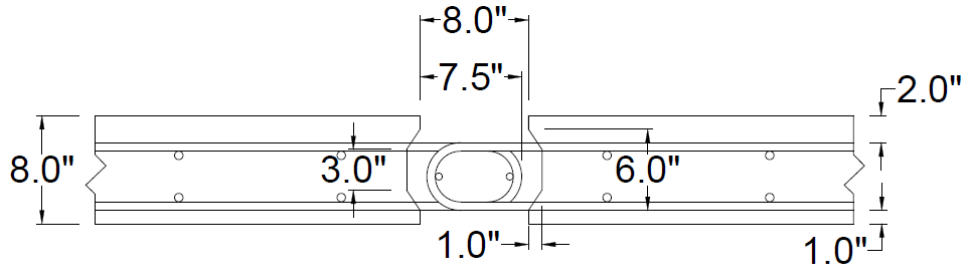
Cross-Section of Precast Bridge System with Single-Unit Panel
